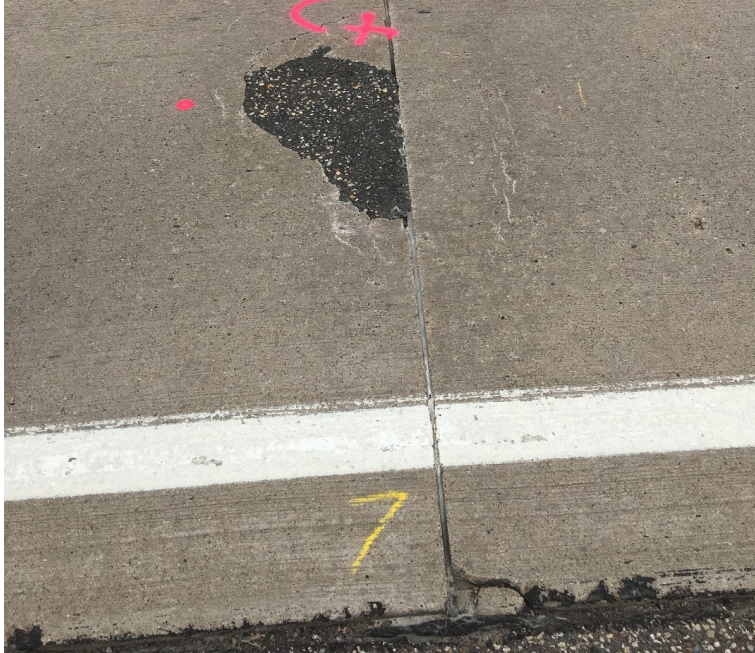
Photo. Joint spalling with asphalt patch and evidence of new cracks that could potentially lead to additional spalling on TH 610 in Hennepin County, MN.
